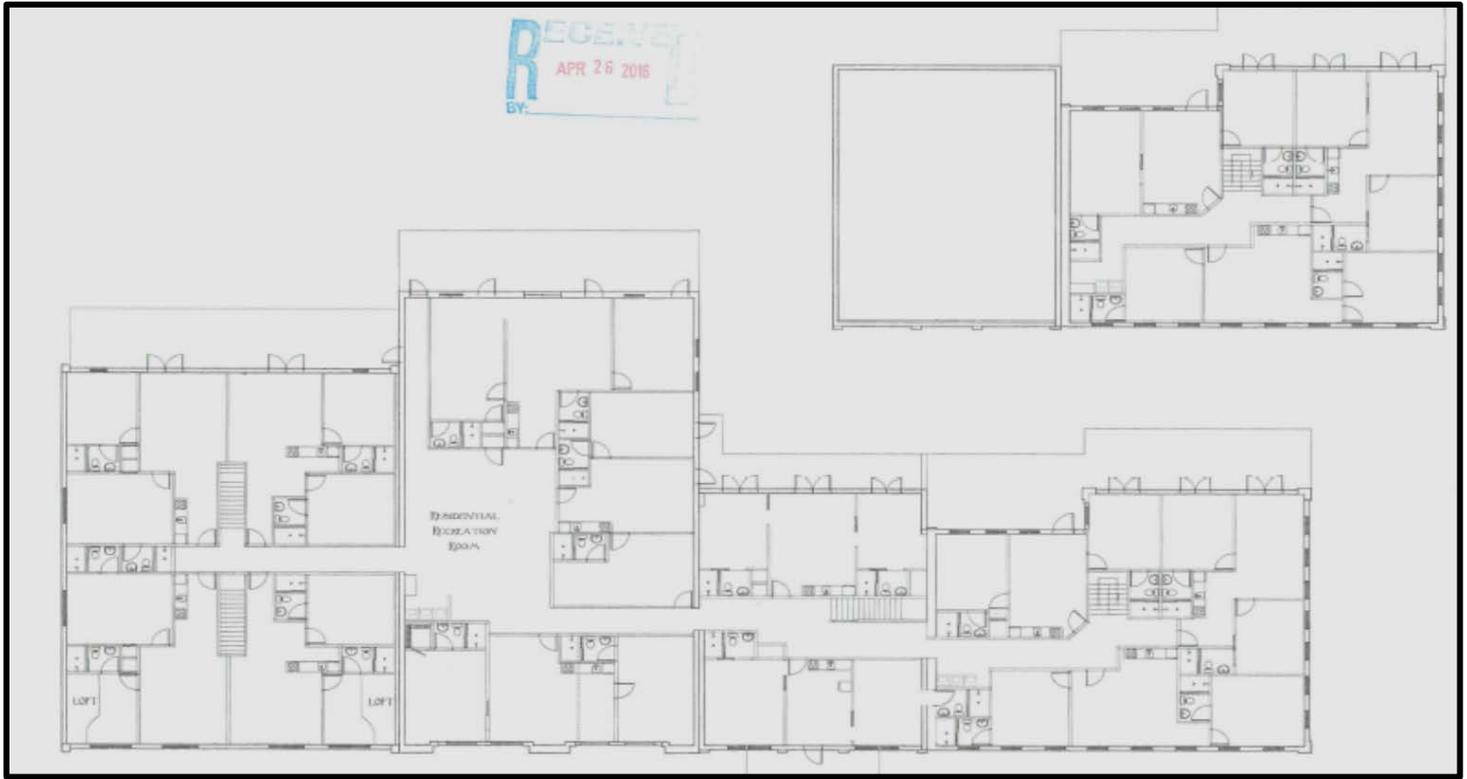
2<sup>nd</sup> & 3<sup>rd</sup> floor plans (above)
